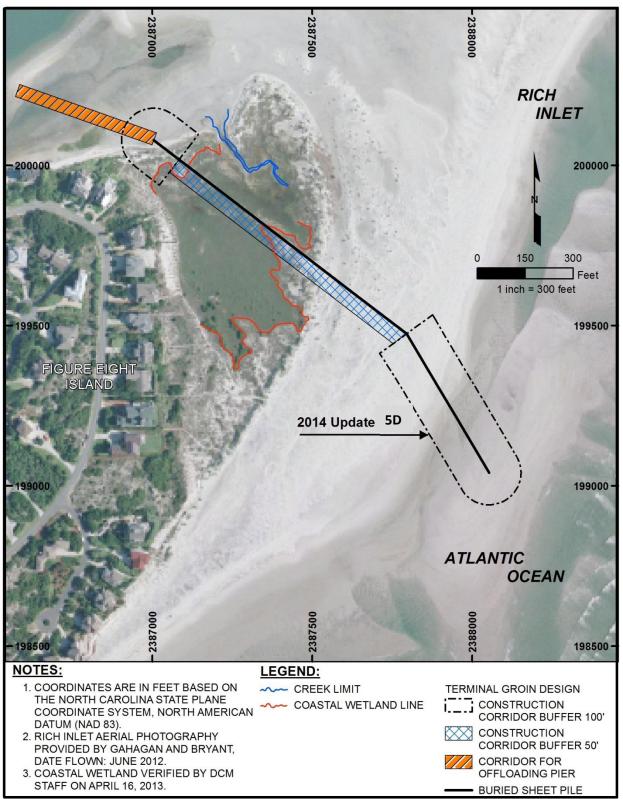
Footprint of the terminal groin, construction corridor, and offloading pier for Alternative 5D.
